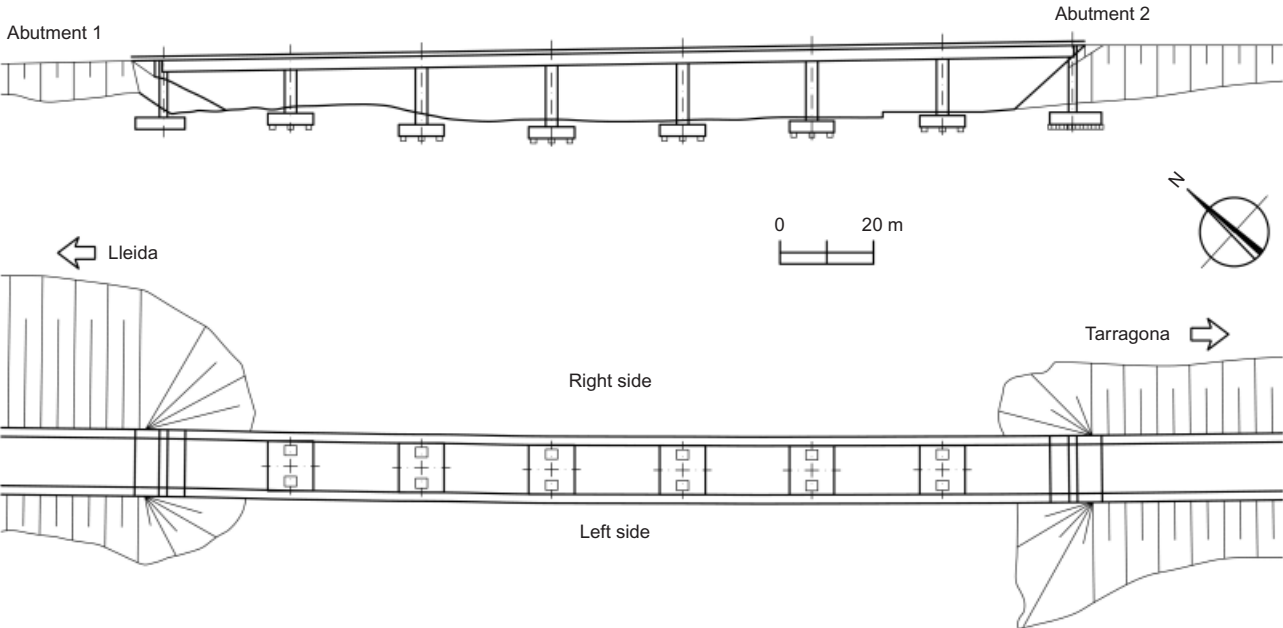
Longitudinal profile and plan view of Pallaresos bridge
